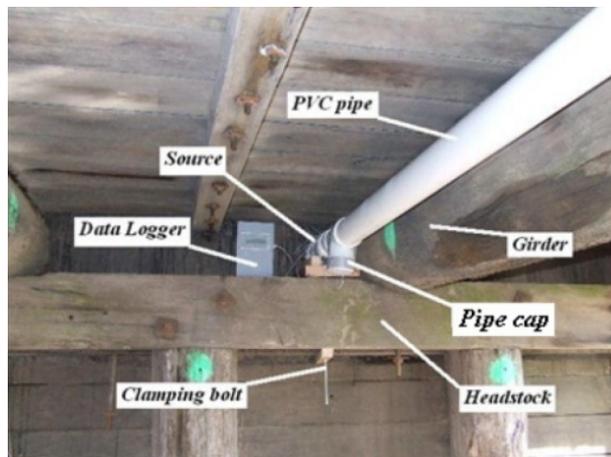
Typical installation of laser source and logger under a timber beam bridge (Moore, 2009)
